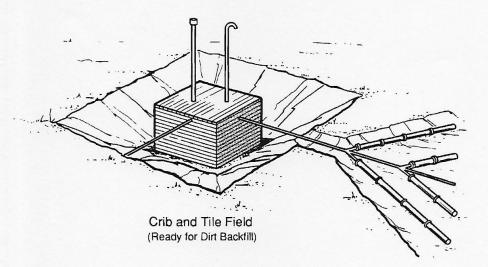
Typical Ground Disposal Facilities (Brown et al. 1956)
